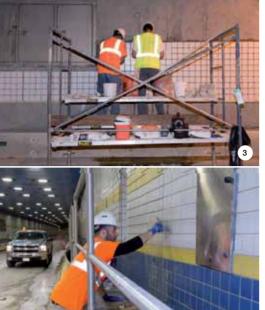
Installing ceramic tiles with LILTRAFLEX 3 PHOTO 4. Grouting tile joints with ULTRACOLOR PLUS FA. PHOTO 5. A view of the tunnel after completion of the works.
